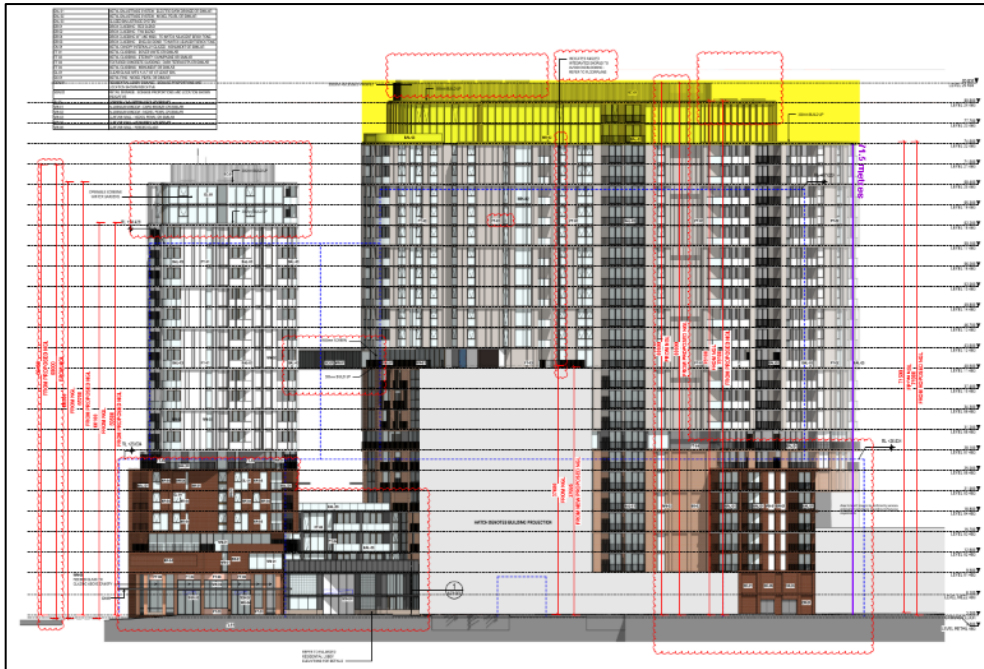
Northern elevation of Building 02 marked up to show extent of building height reduction required
